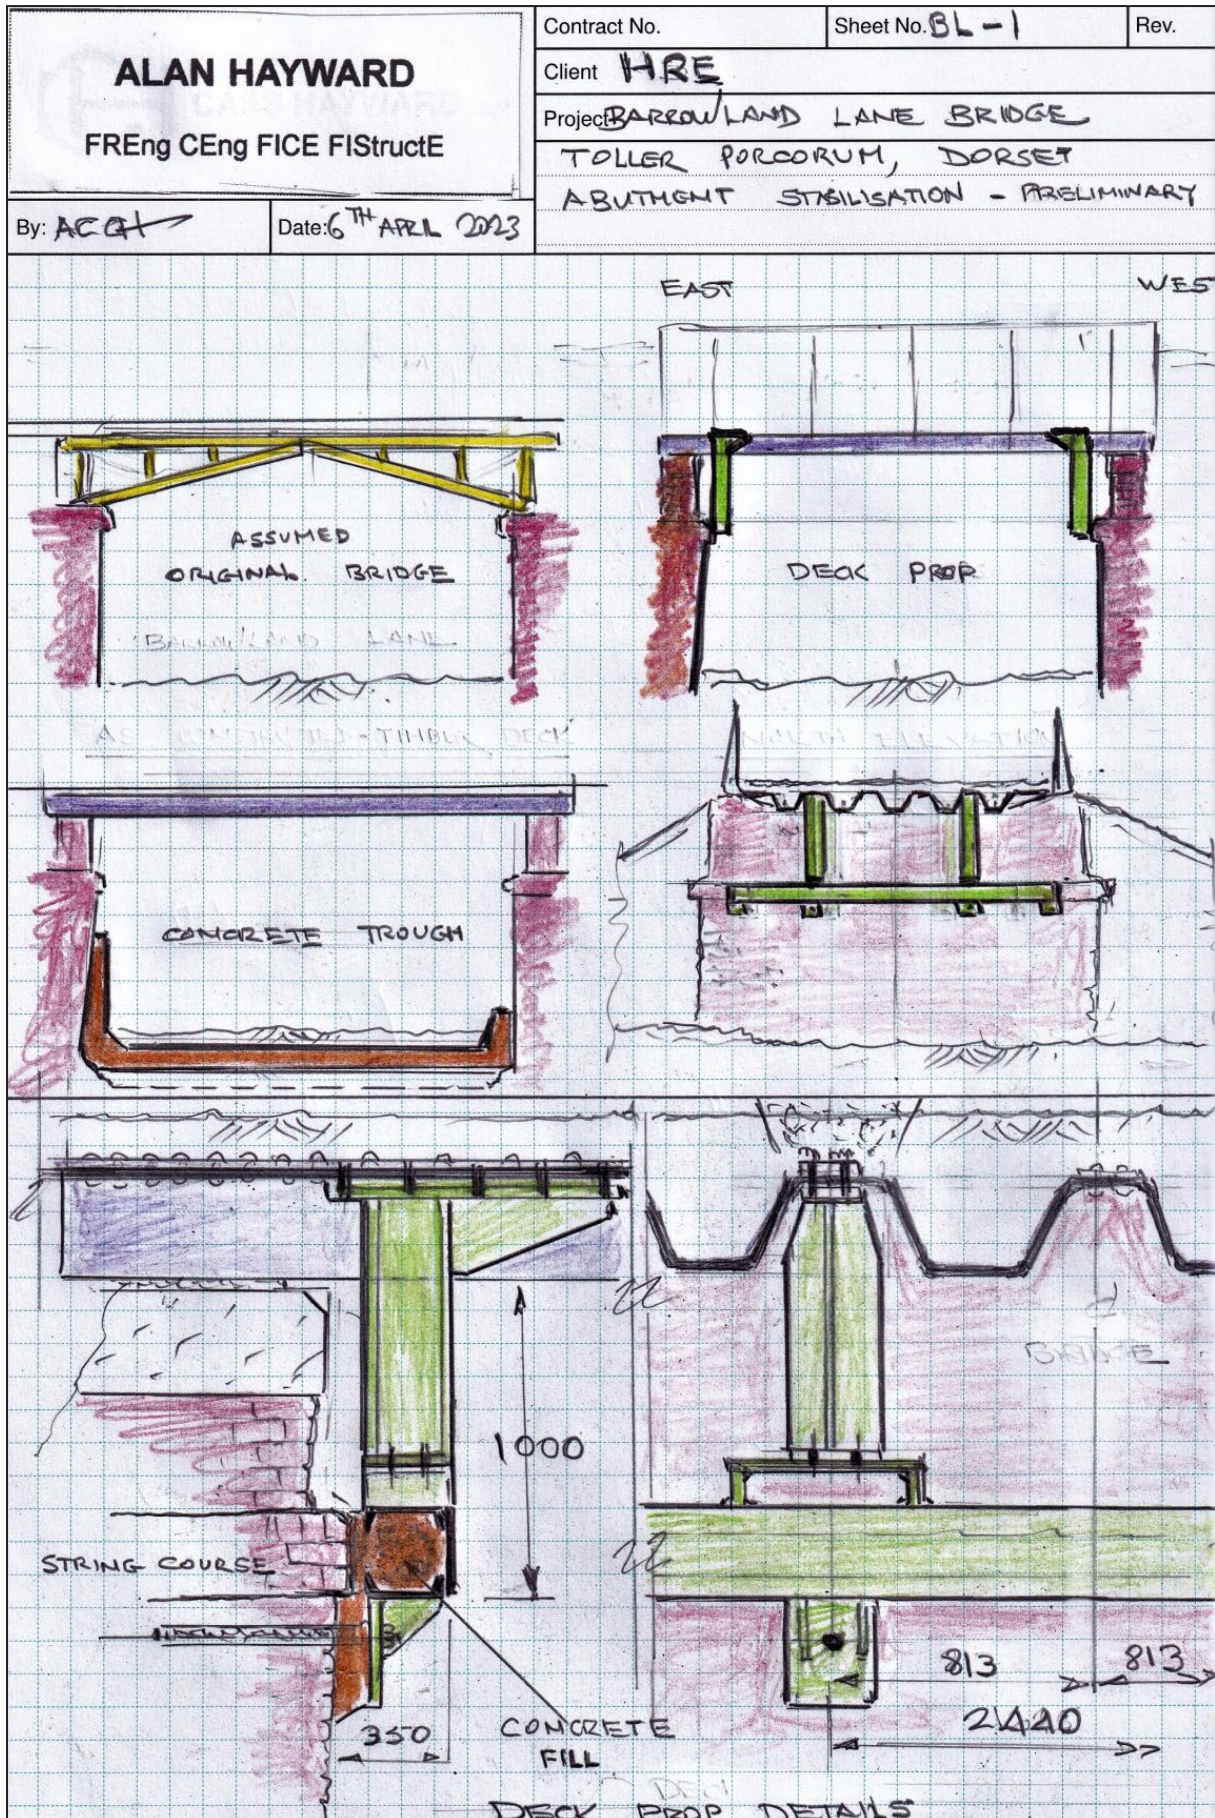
Sketch BL-1 showing two alternatives for stabilisation of the east abutment.
